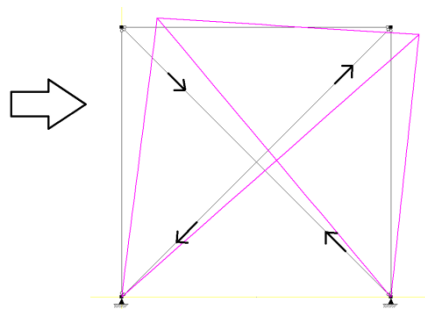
Forces in the diagonal braces when subjected to lateral load
